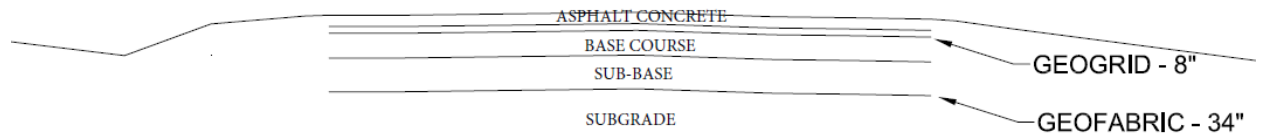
The as-built cross section of the test section FWD4-8. Horizontal scale is equal to vertical scale.
